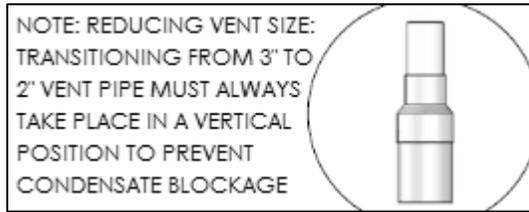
Transitioning from 3" to 2" Vent Pipe
